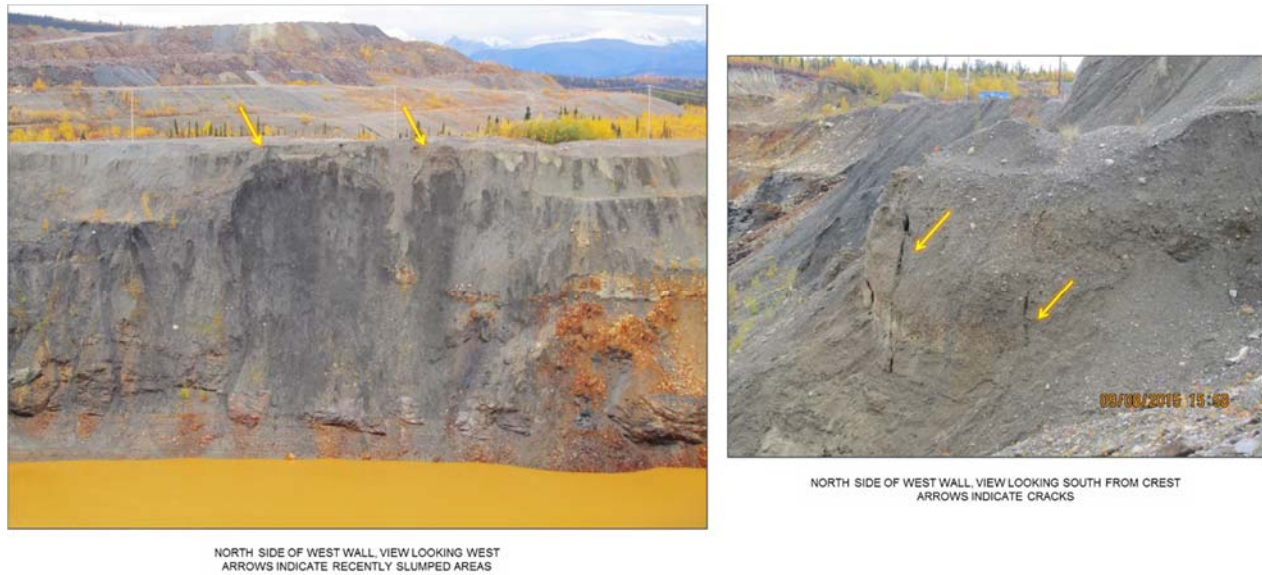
Cracks and Sloughing in Upper Part of Vangorda West Wall – North Side
